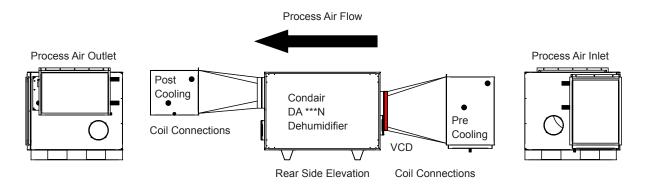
Installation layout of the cooling modules with the DA desiccant dryer
